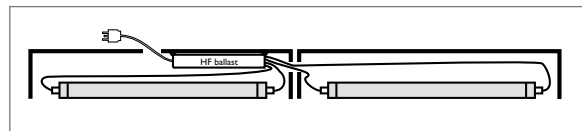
Preferred construction of one HF ballast operating two luminaires.
